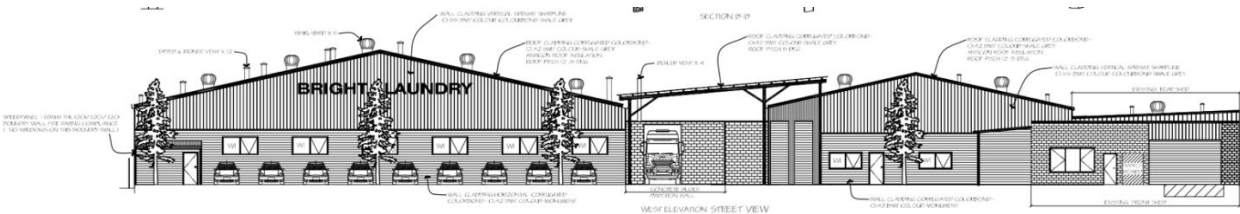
PROPOSED MCGEEHAN CRESCENT ELEVATION
